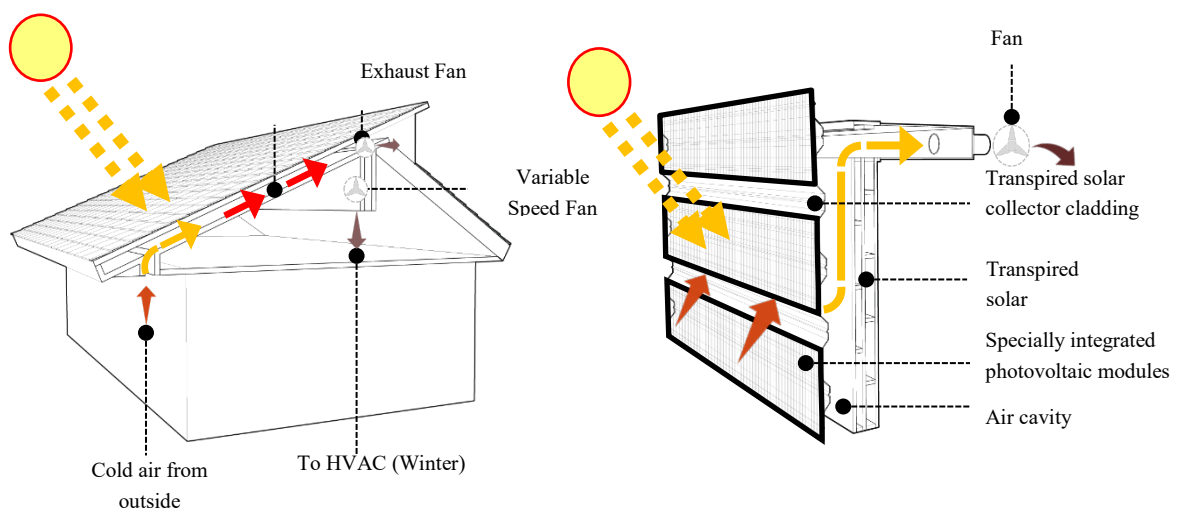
Examples of BIPVT systems applied to (a) roof, (b) vertical façade (Hachem-Vermette, 2020)
